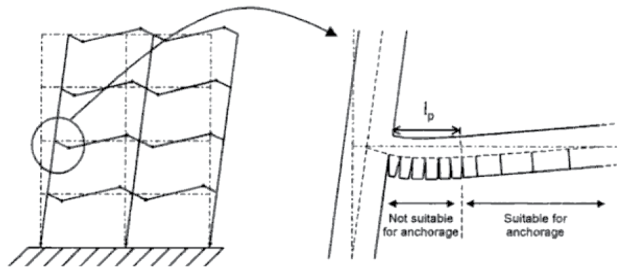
Member cracking assuming a strong-column, weak girder design
